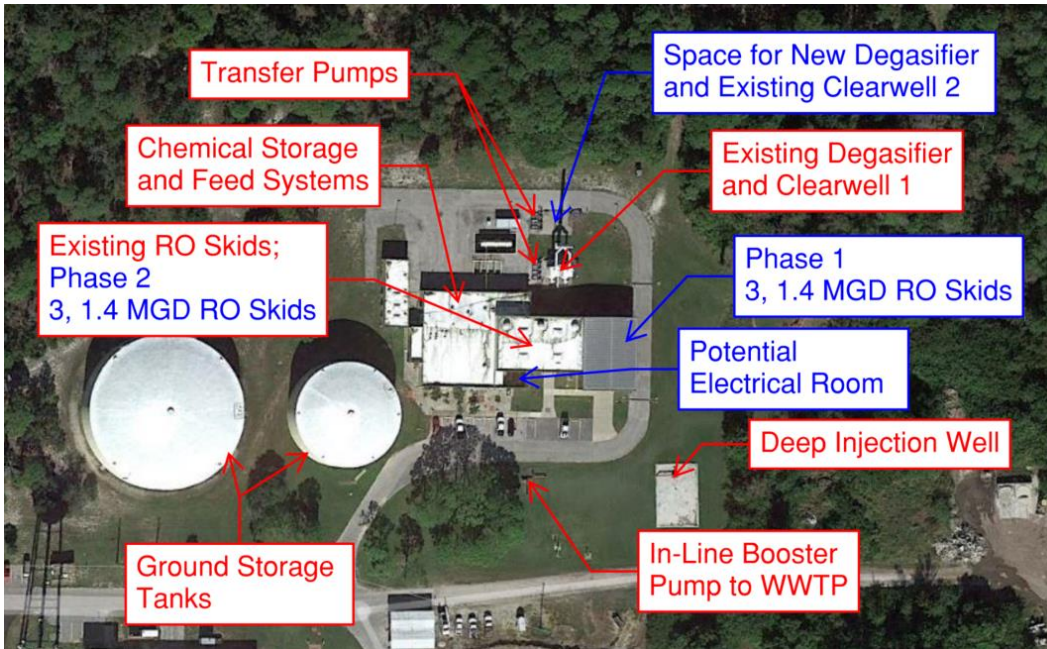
Alternative 3a Existing and Future RO Plant Locations (Phase 1 and 2)
